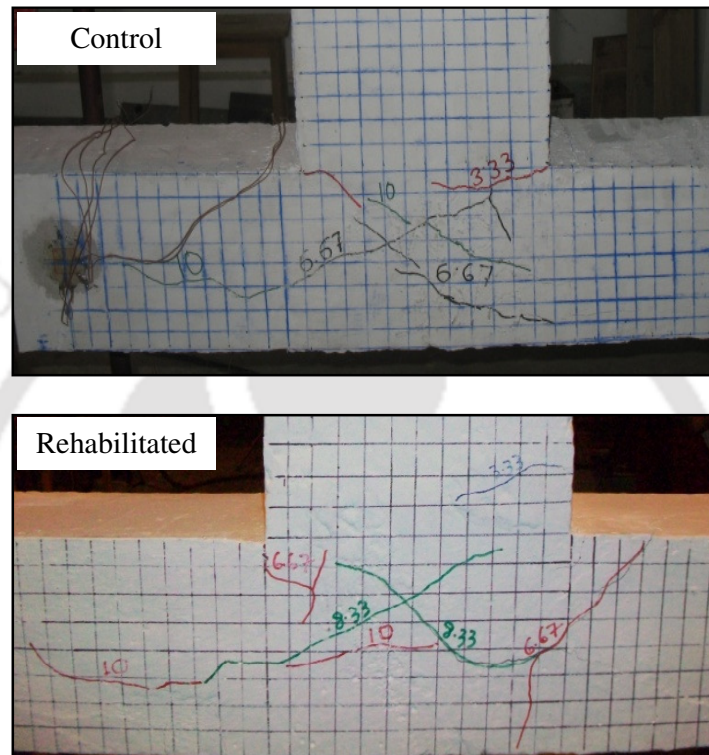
Cracks appearance for CWSM specimens during initial stages of loading under loading type-1
